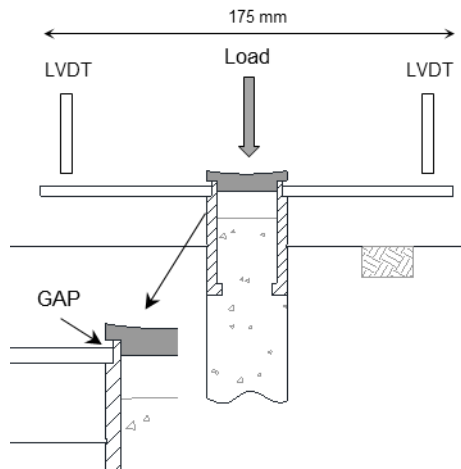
Load measurement system (a) vertical cross section, (b) detail of the load cells plate.
